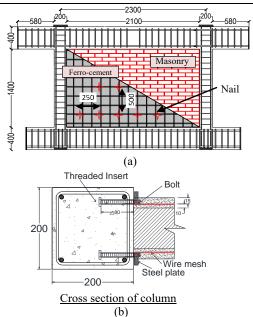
(a) Geometry of masonry infilled RC frame and (b) connection of wire mesh to RC frame (dimensions are in mm)
